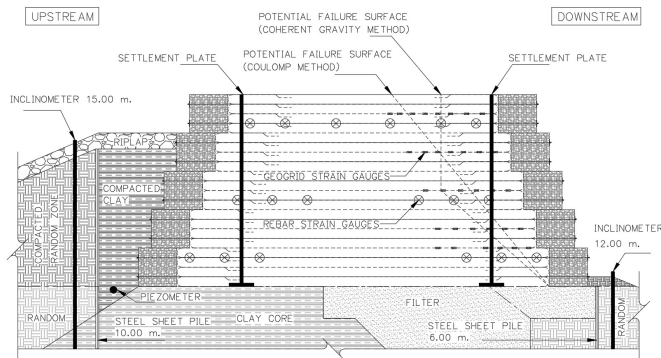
Schematic diagram of the test section with instrumentation (Left Bank)
